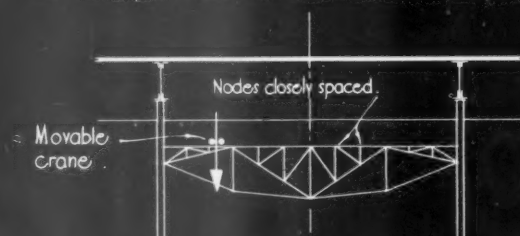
heavily loaded crane girder constructed as truss shown in figure 8
